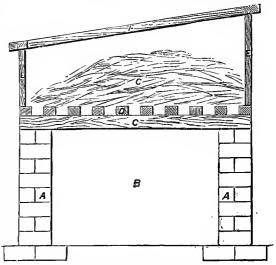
SECTIONAL END VIEW OF A CHAMBERED FRAME.
